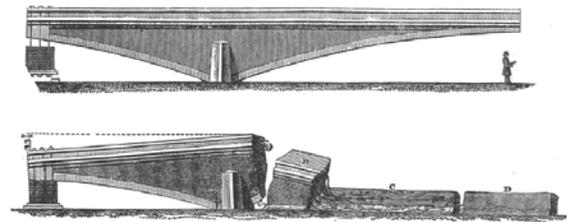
Wrought-reinforced brick cantilever, Marc Brunel, 1832. (Peters¹)
